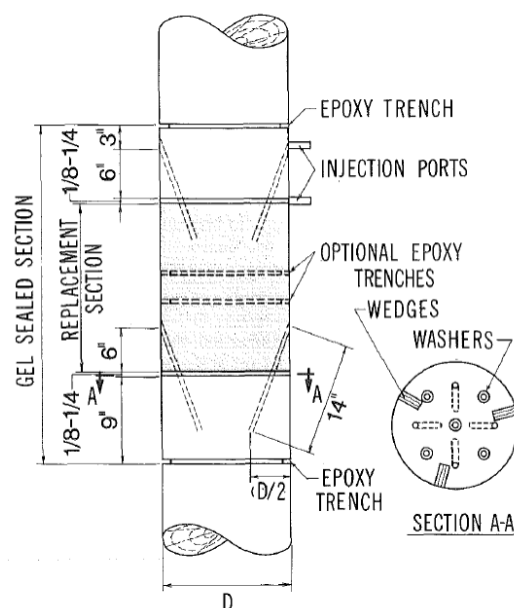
Schematic of cutting and posting timber pile repair (Avent, 1989)
